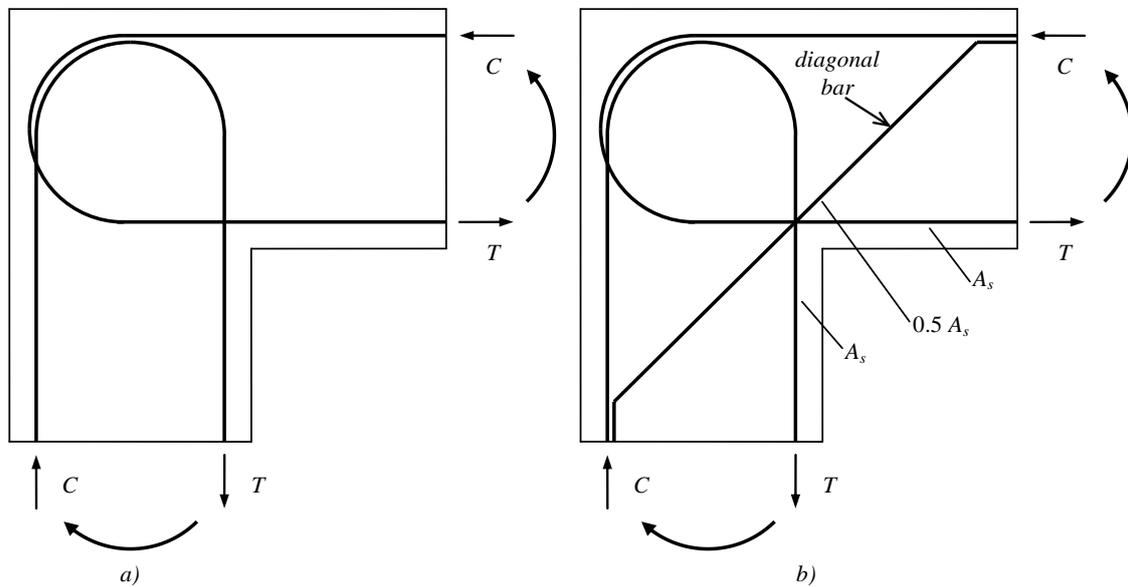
Arrangement of reinforcement for frame corners with opening moment, a) reinforcement loops are used in the solution of Type 3 to confine the concrete within the corner, b) the solution of Type 4 is further developed by adding diagonal bars used to strengthen the corner. The figure is taken from Johansson (2000).
